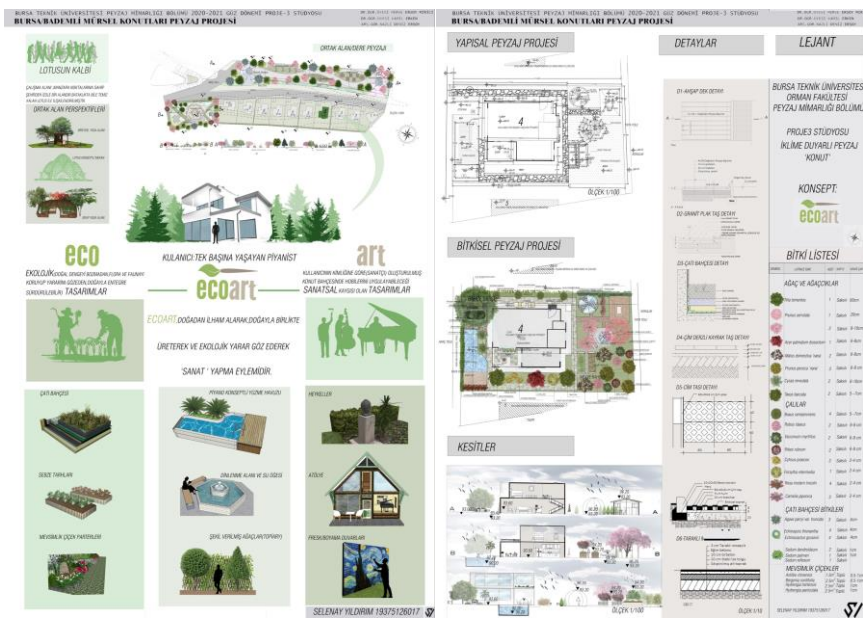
Concept Approach and Technical Drawing Sheets (Selenay Yıldırım)
